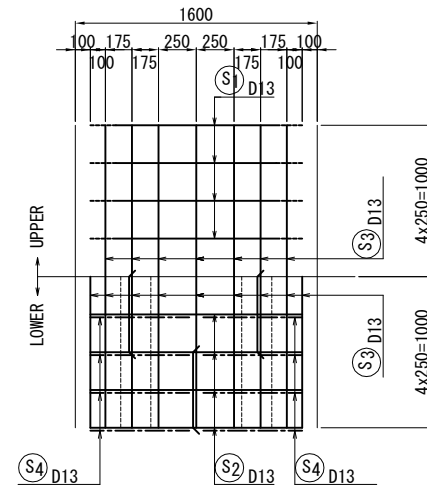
DETAIL OF BOX CULVERT TYPE 1000 x 1000
